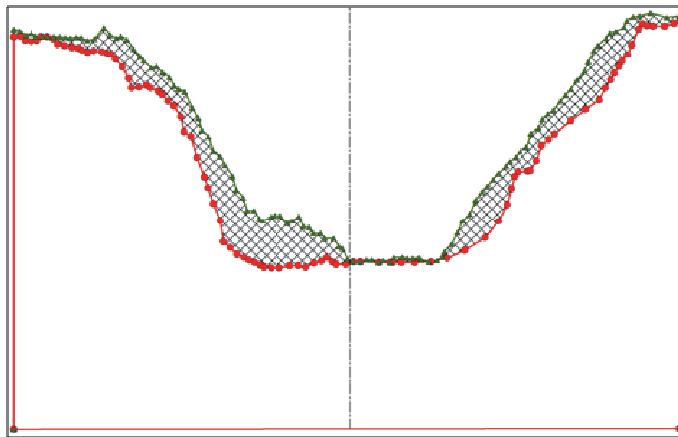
Cross-sectional area generated with closed polygons by providing a base elevation.
